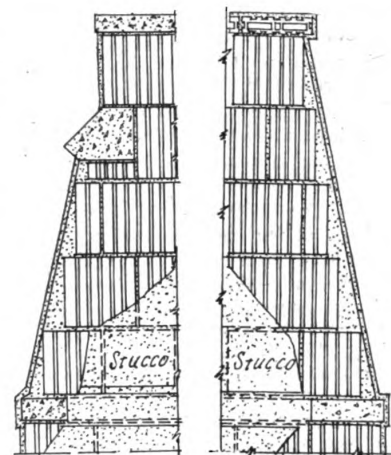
Buttress built of hollow tile, stucco-coated. It has concrete cap and fill.
